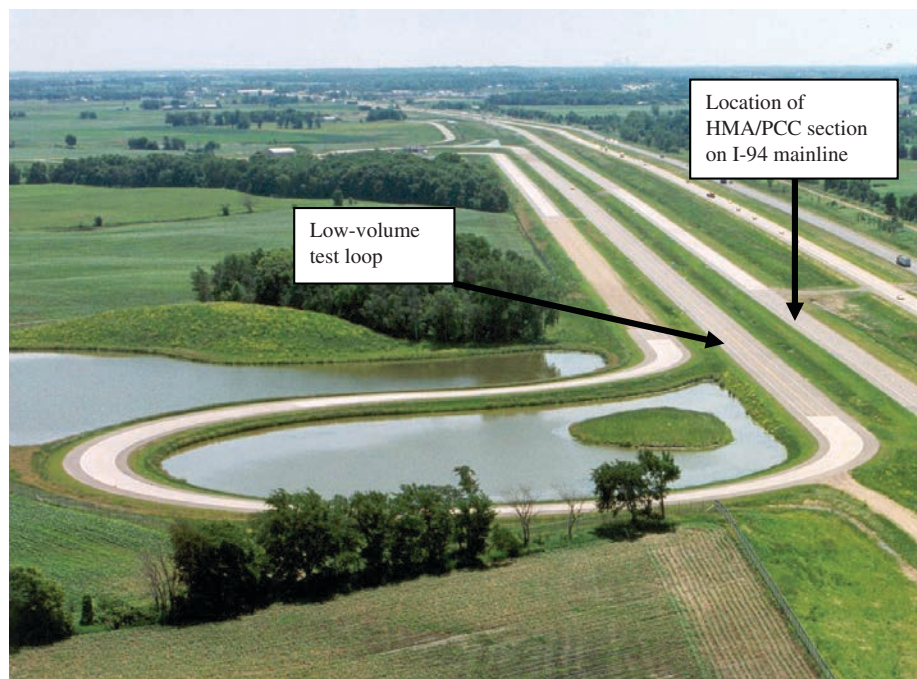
Aerial view of MnROAD facility and location of HMA/PCC test section. Note that the mainline I-94 traffic is diverted to the center lanes during construction and testing.
